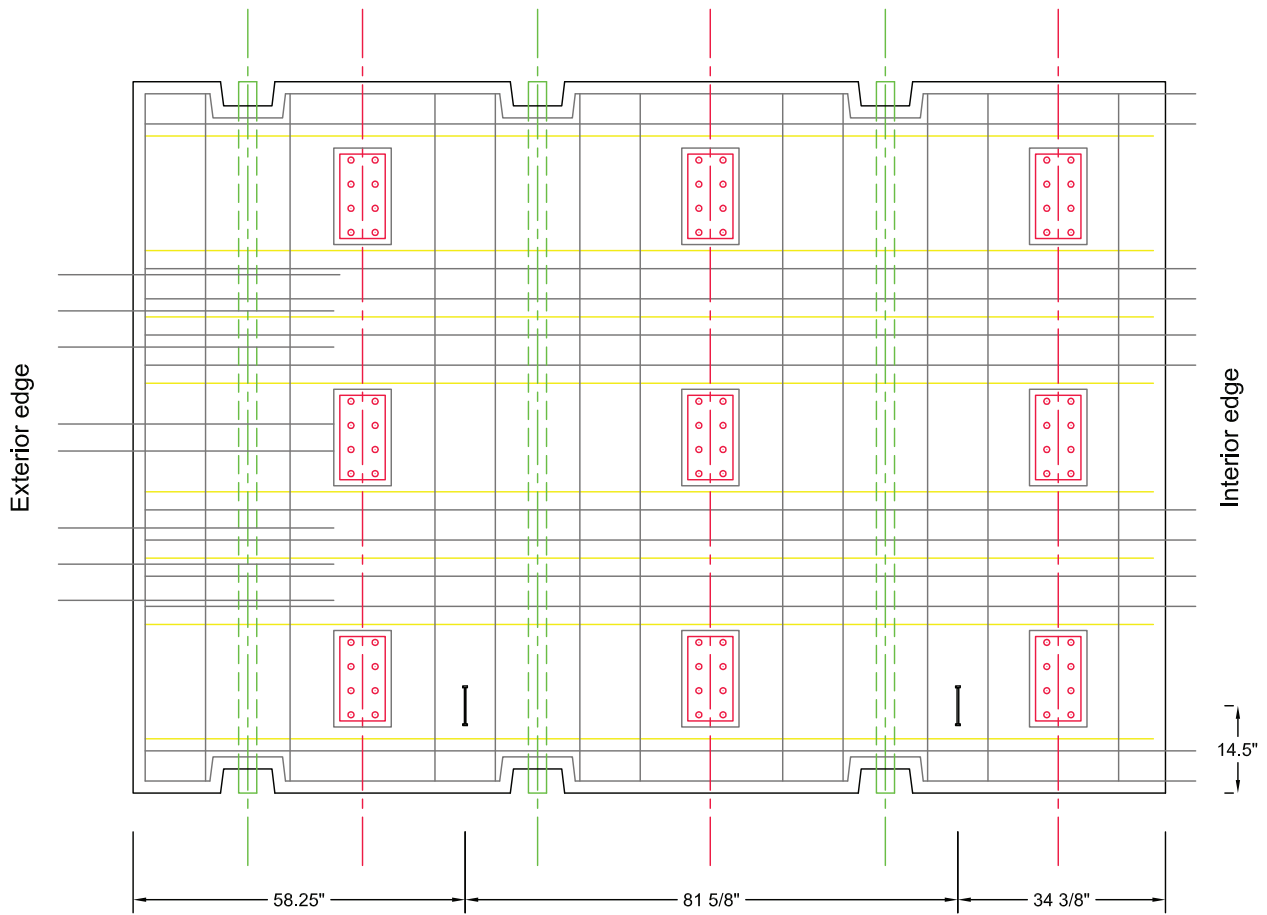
Detailed Panel Drawing with Vibrating Wire Gauge Location
